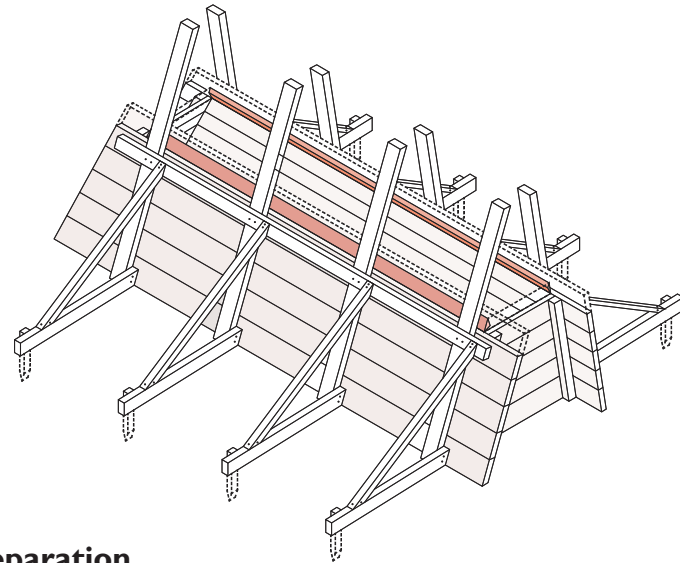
Construction diagram with formwork details and terminology (Source: created by authors)
